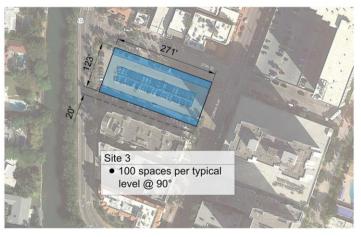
Conceptual Parking Structure Layouts – Middle Beach
